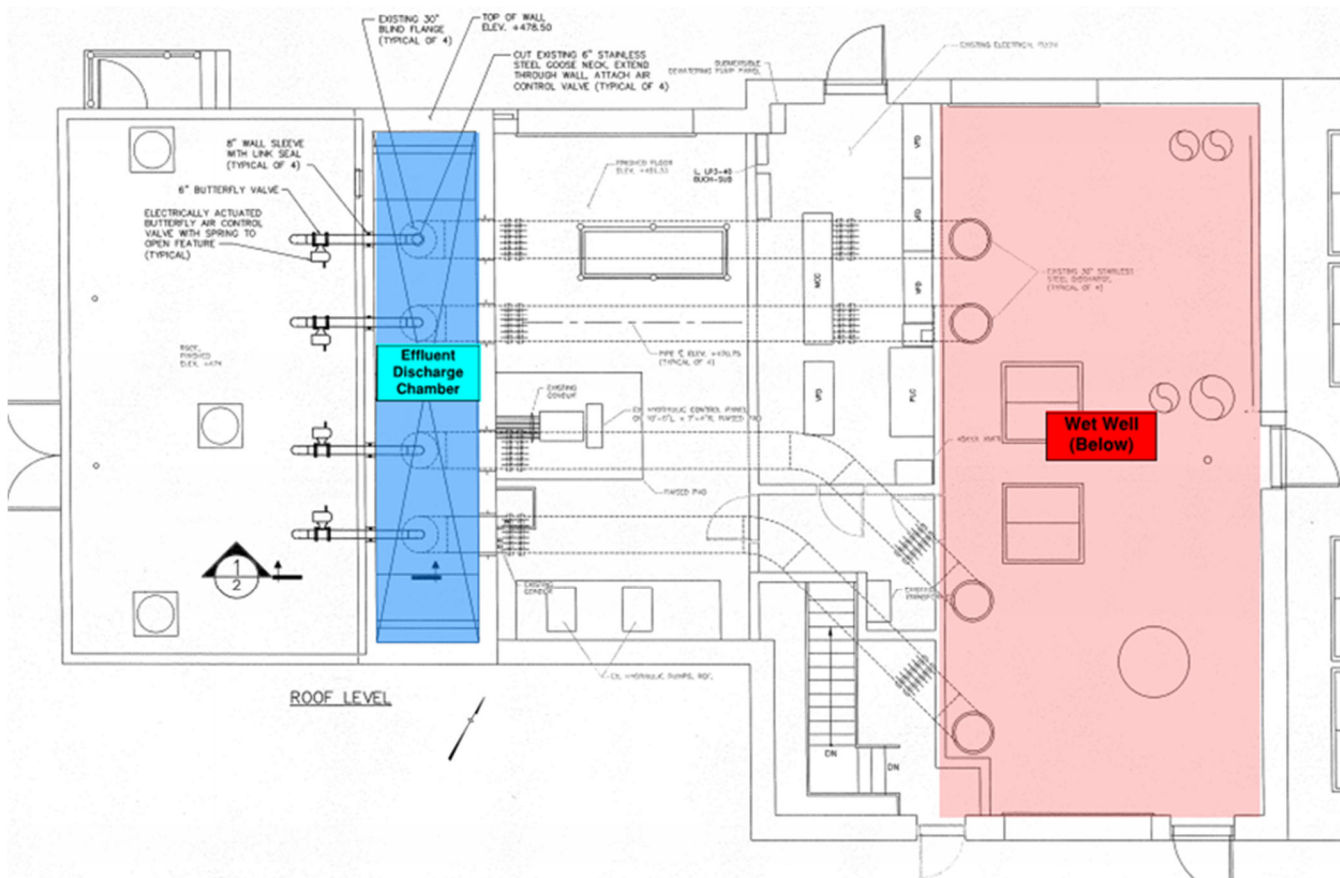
Pump Station 6 Site Layout (Adapted from 2010 Record Plans)
